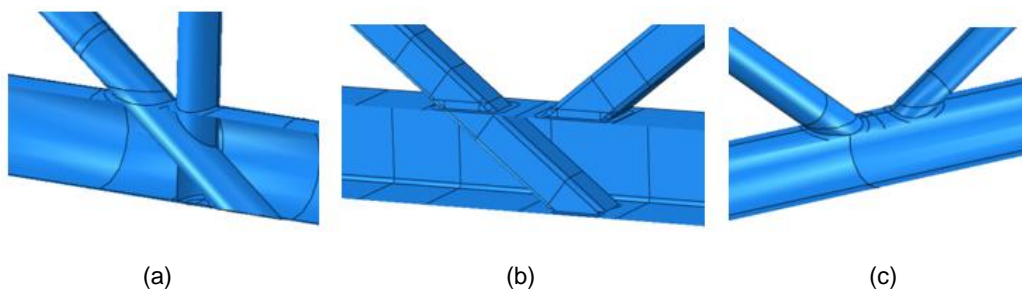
Examples of joint details: (a) CHS with D2 joint; (b) SHS with D1 joint; (c) CHS with R joint.
